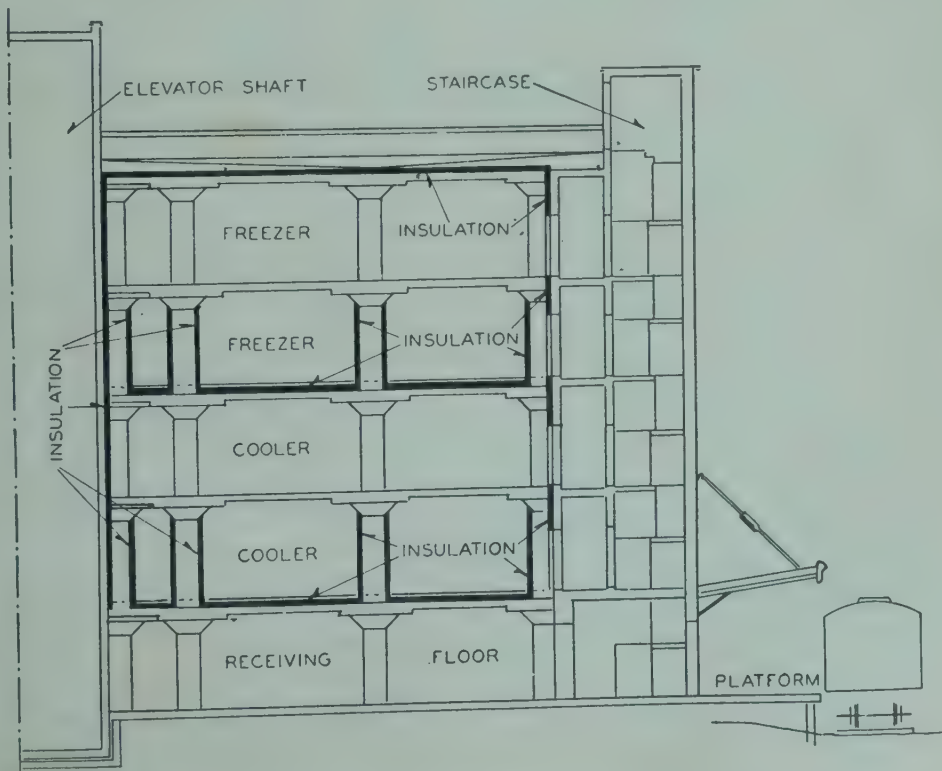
Section of Typical Building with Curtain Wall Construction.
